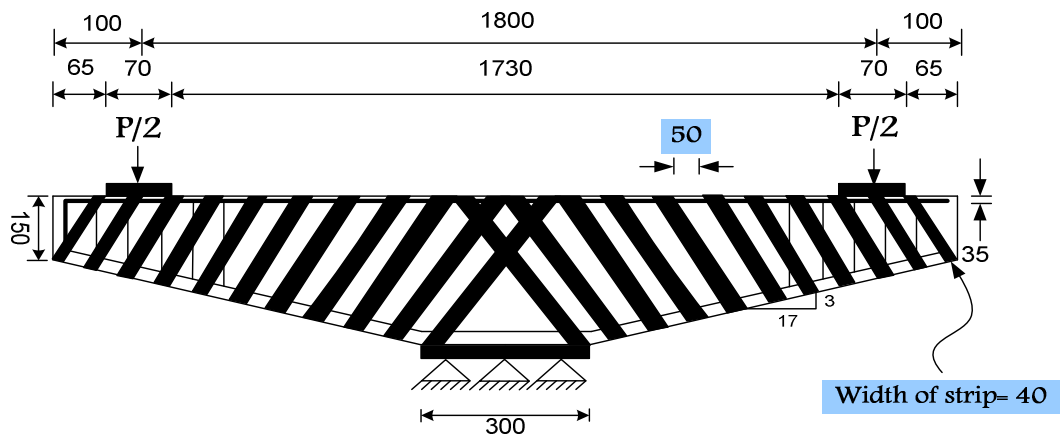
Details of Tapered Beam (TB-0S-C45°)
